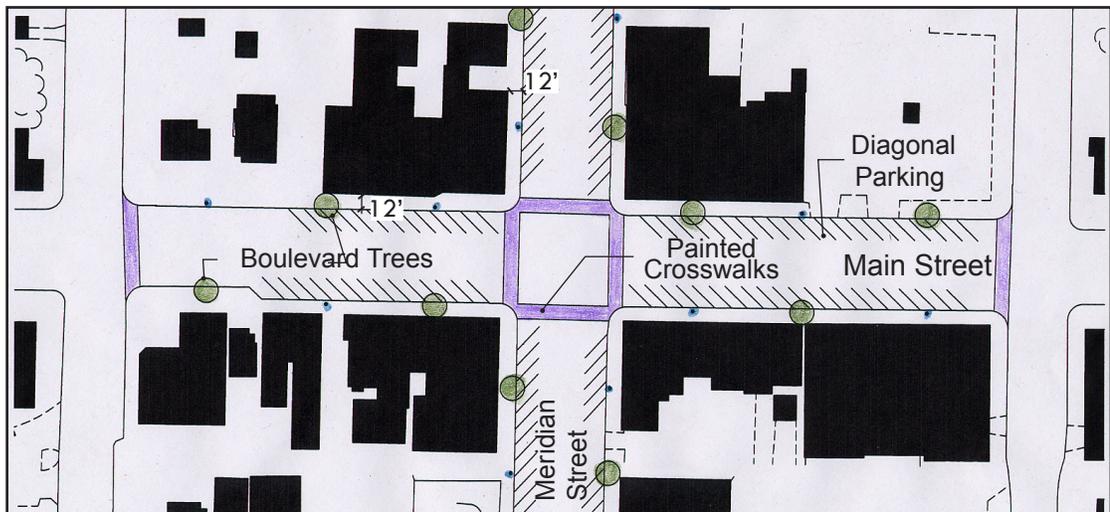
Intersection of Main and Meridian Streets Guidelines Plan, CRD, 2008.
